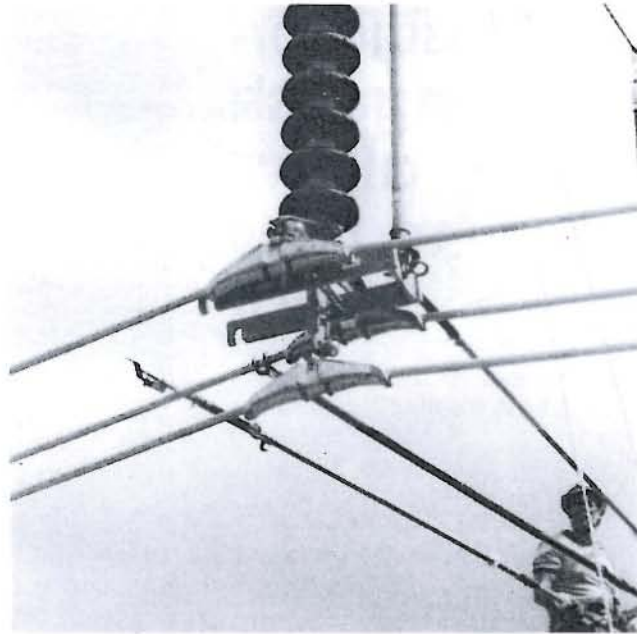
Saddle tool was placed over the center insulator-attachment bracket to support lift sticks.
